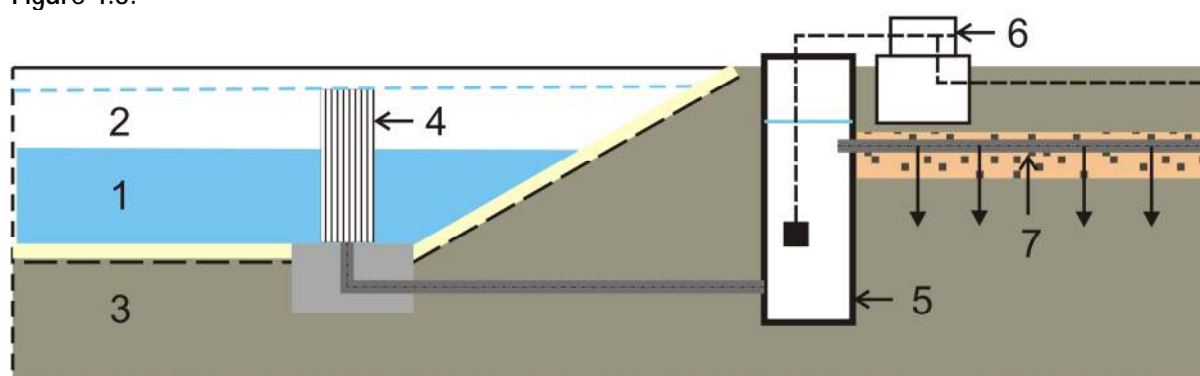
Arrangement of Ground Sealed Storage Reservoir: 1-sump, 2-retention area, 3-sealing by plastic foil and protective geotextile, 4- outlet and sampling equipment with soft bar screens and pivot cap, 5-suction sump, 6-pump aggregate, 7-infiltration perforated pipeline for excessive outflow (Šálek and Tlapák, 2006)
